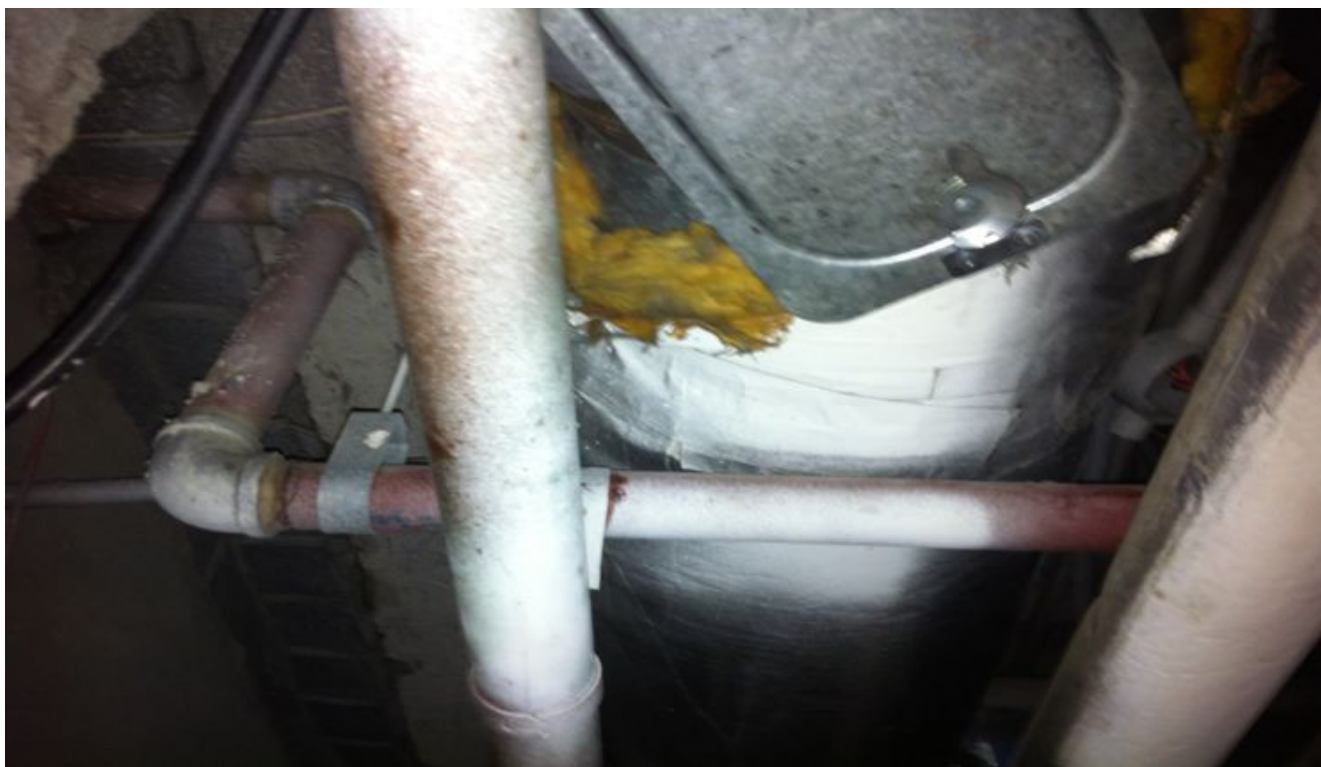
SMF insulation surrounding ductwork and oversprayed SMF insulation throughout ceiling spaces of the North Wing – Menzies Hotel.
